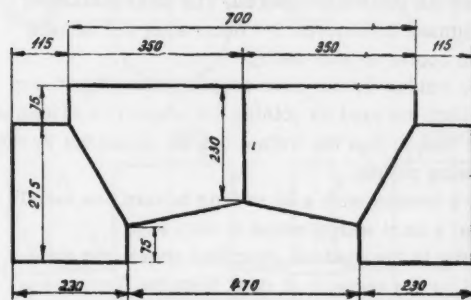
The arch of the side window laid of blocks; 1) block; 2) abutment brick.
